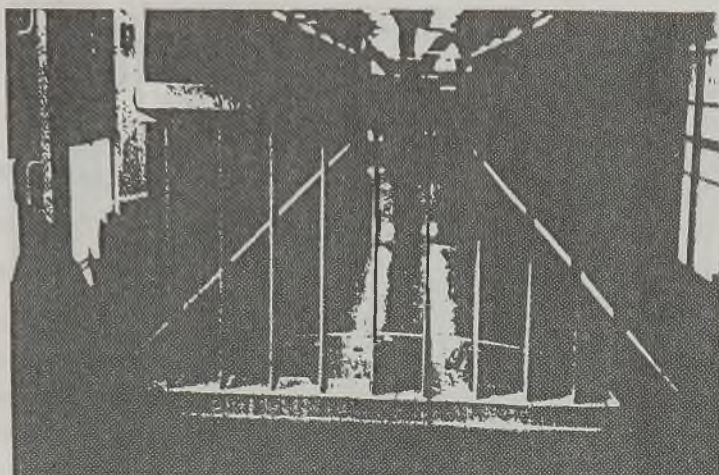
Segment of the original parapet on the turntable in the first working section.
